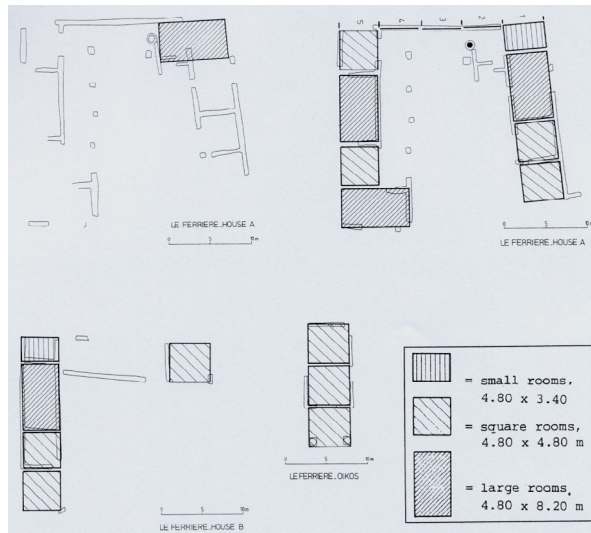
Schematic reconstruction of building system used for the courtyard buildings at Le Ferriere (Maaskant-Kleibrink 1991, fig. 25)
